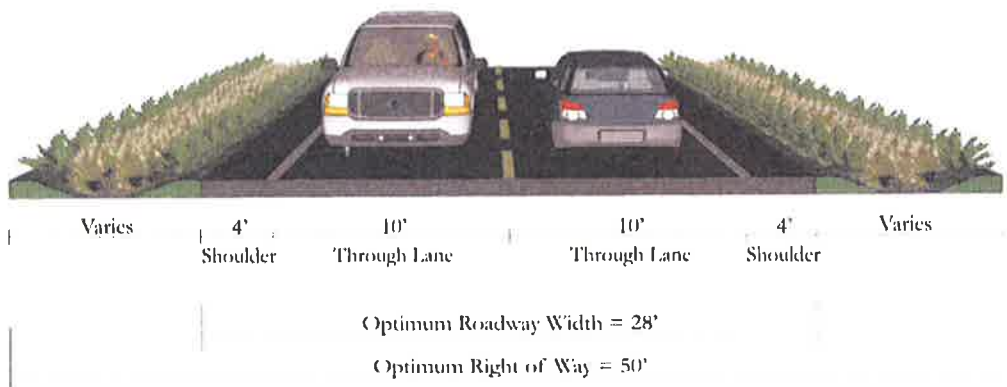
Minor Arterial Roadway, outside an UGB
